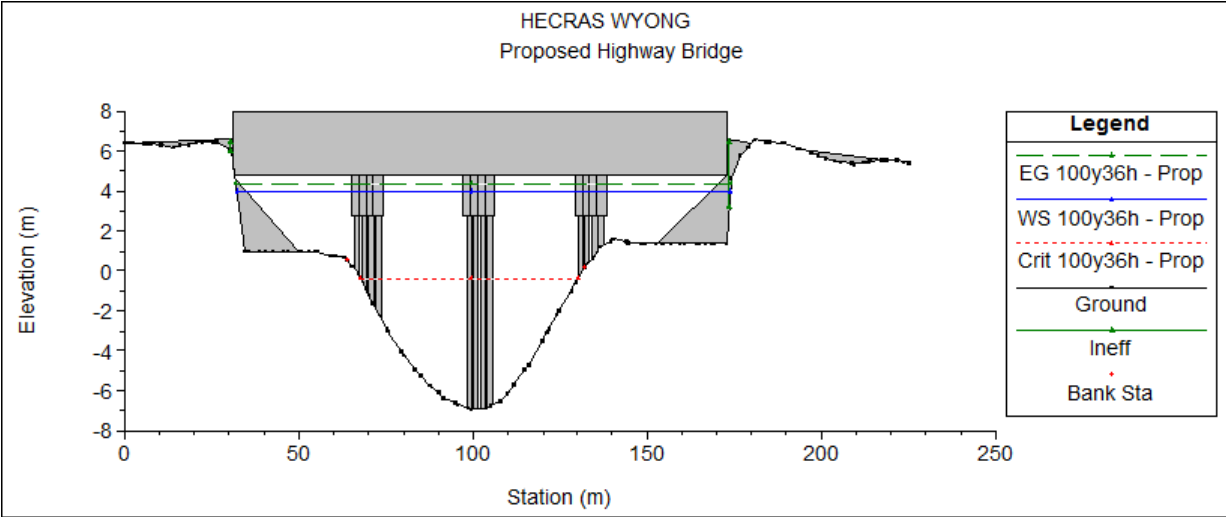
HEC-RAS cross-section at proposed twin bridges over Wyong River (River Station 300.00)
